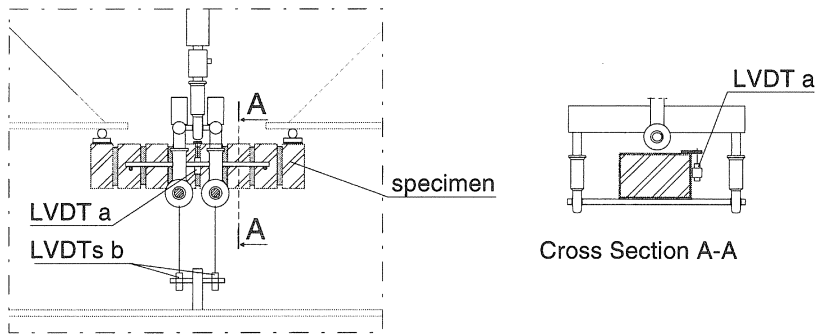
Detailed view of a specimen in the 4-point bending test arrangement.
